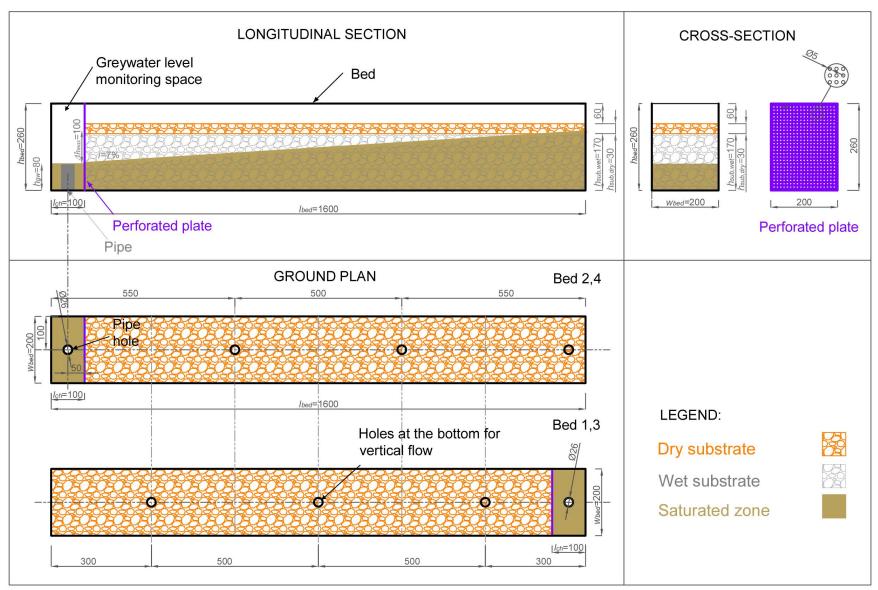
Dimensions of green walls bed, substrate, and demonstration of saturated zone in the substrate
